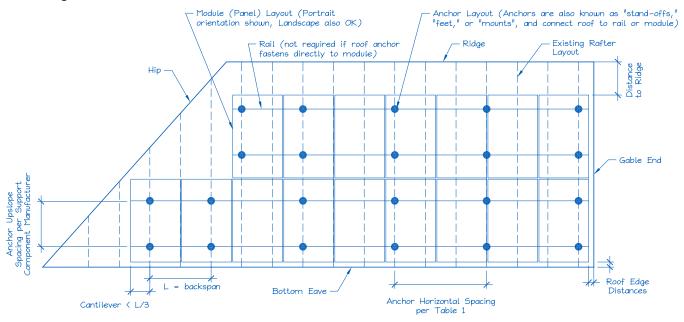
Sample Solar Panel Array and Anchor Layout Diagram (Roof Plan).
